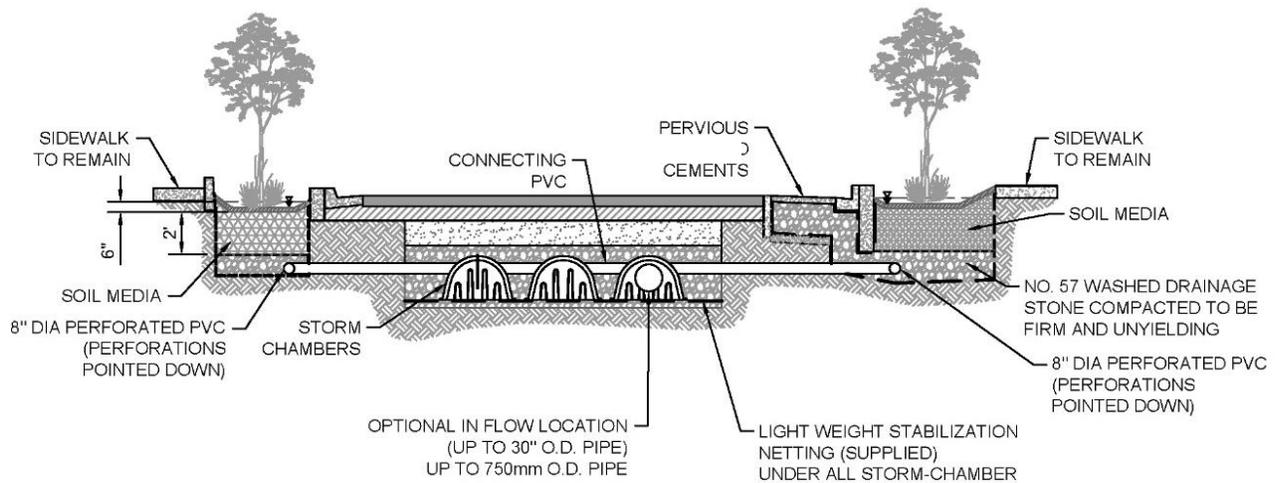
TYPICAL GREEN STREET CROSS SECTION
